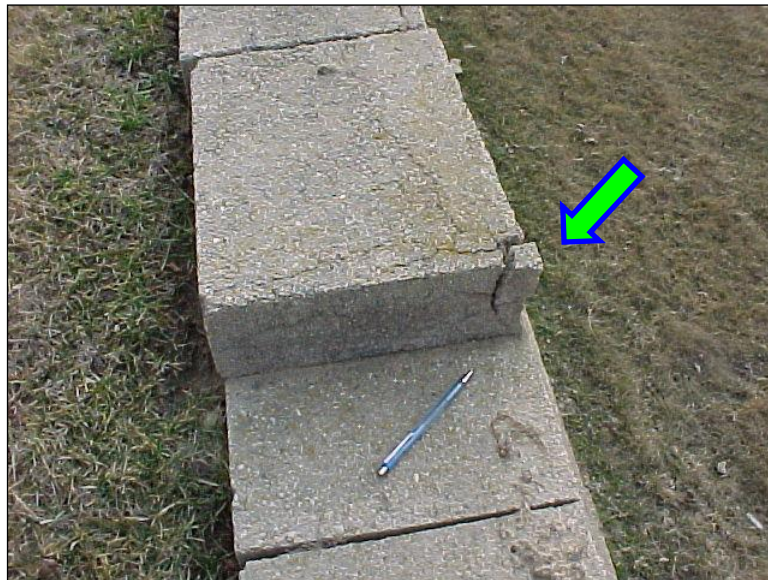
Corner Break with Cracking on the Top Face.
